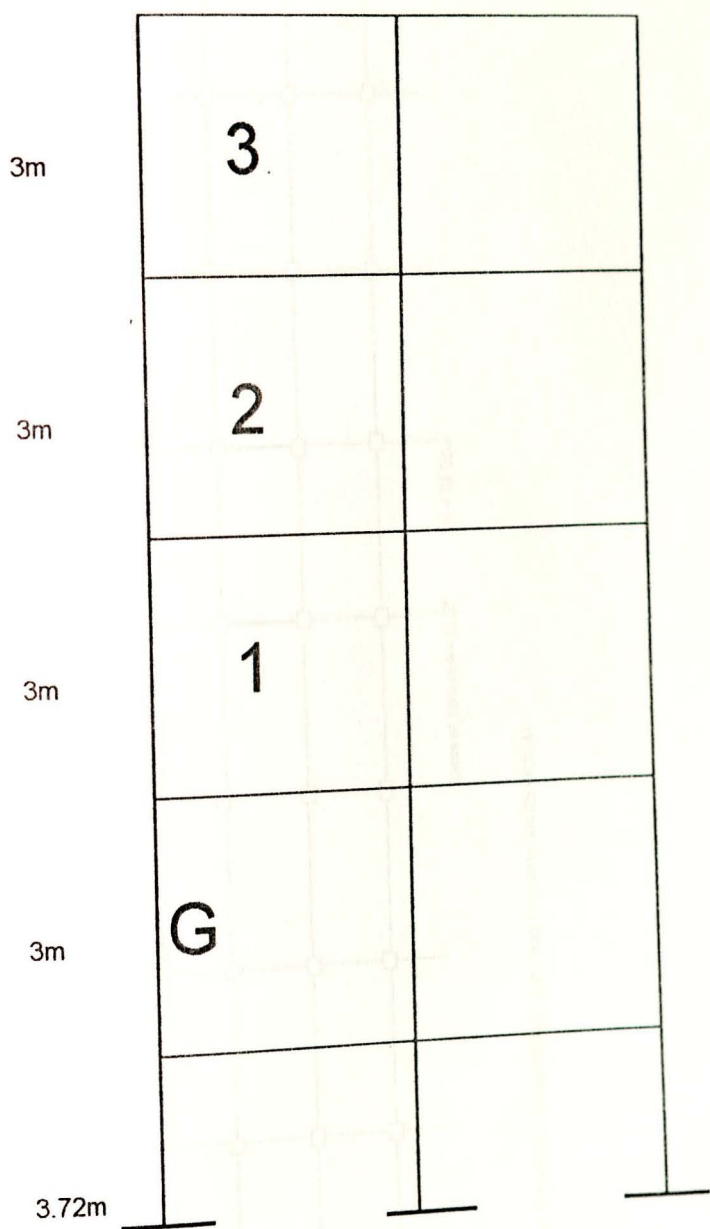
ETHIOPIAN GRAIN TRADE BUILDING ELEVATION (BLOCK-B)
